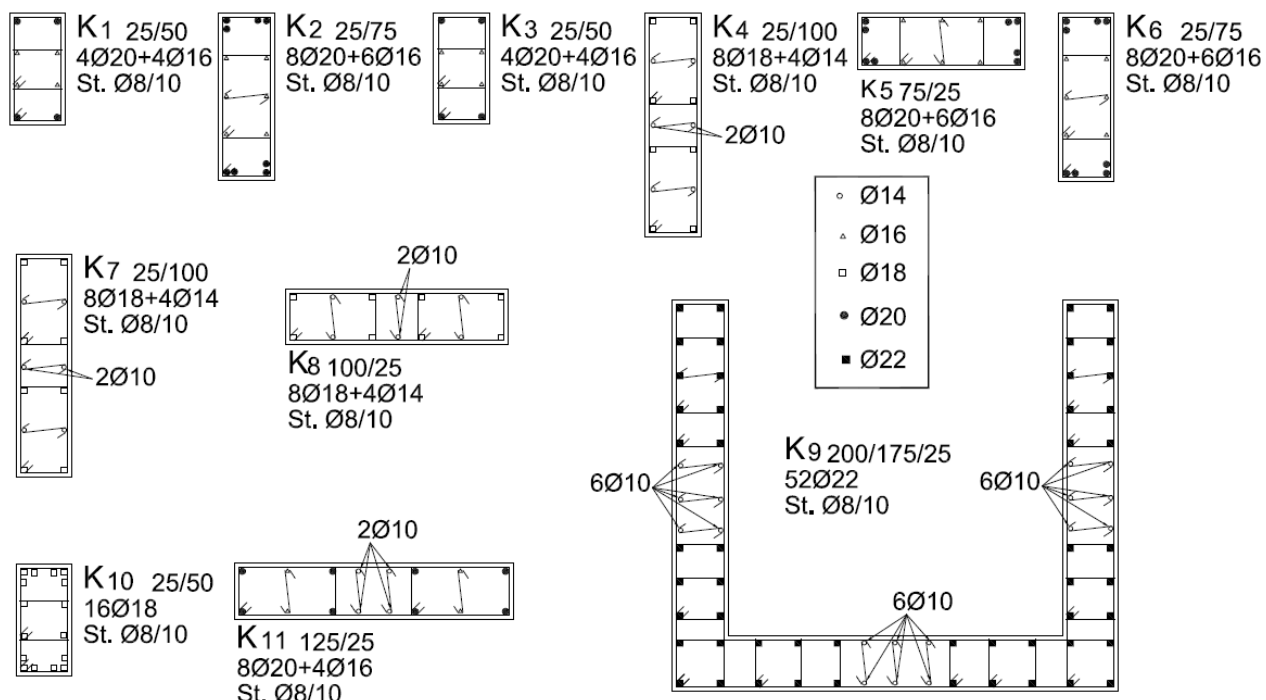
2-STOREY RC BUILDING. REINFORCEMENT DETAILS OF THE COLUMNS AND SHEAR WALLS.
